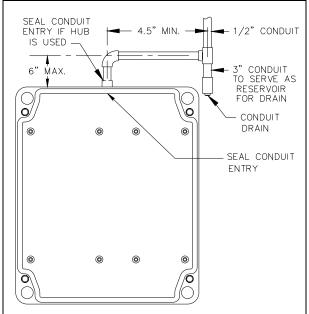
Top entry conduit installation details for metallic enclosures (NOT recommended)
